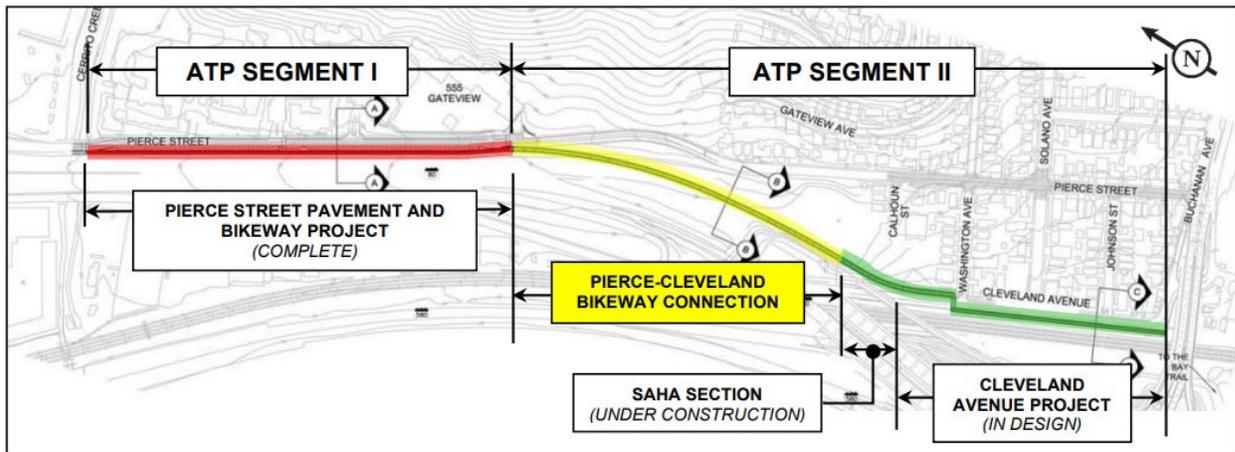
Potential Pierce Street Path Alignment, Kimley-Horn & Associates (2009), amended to including ATP Project Segments and Project Names
